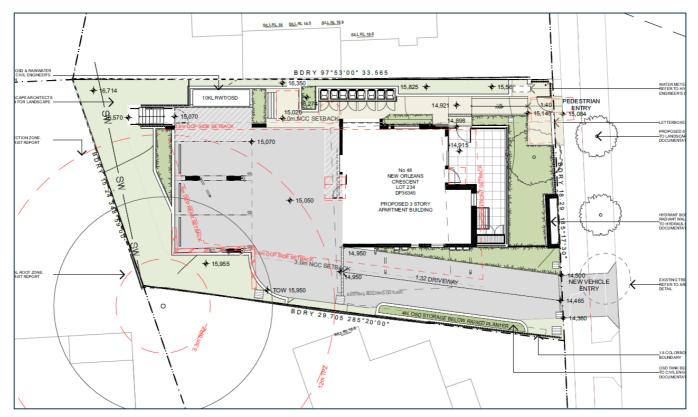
to Figure 12 include extracts from the architectural plans illustrating the proposed development.
